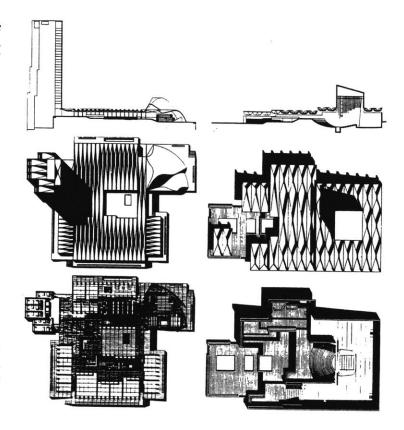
Competition scheme for World Exibition, Copenhagen 1959, longitudinal section, roof plan and ground floor plan. (right)
